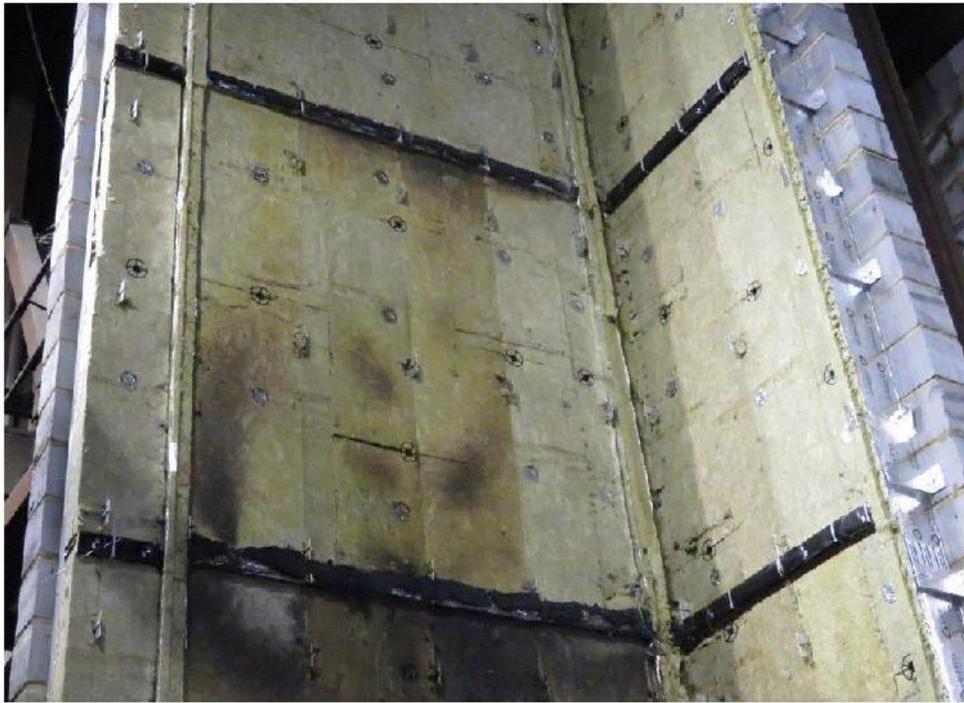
Cladding system beneath ACM panels between the second and third horizontal cavity barrier (approximately 2400-4700mm above combustion chamber).
